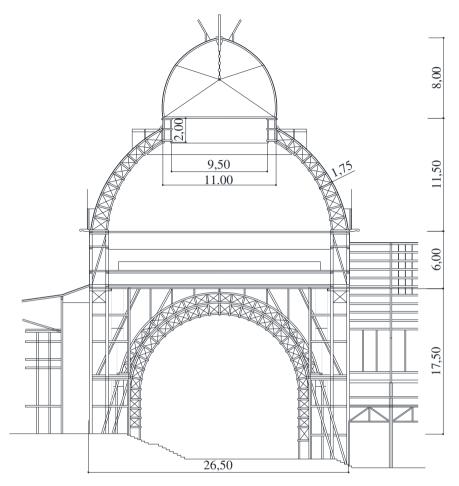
The dome of a temporary facility in Copenhagen was built in 1888 [13]
